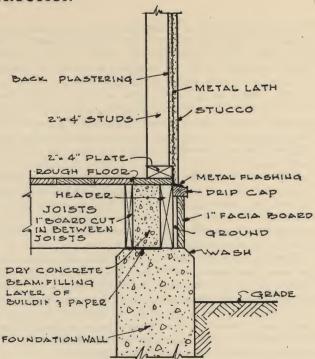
Box Sill Construction, Joists Resting on Masonry.
